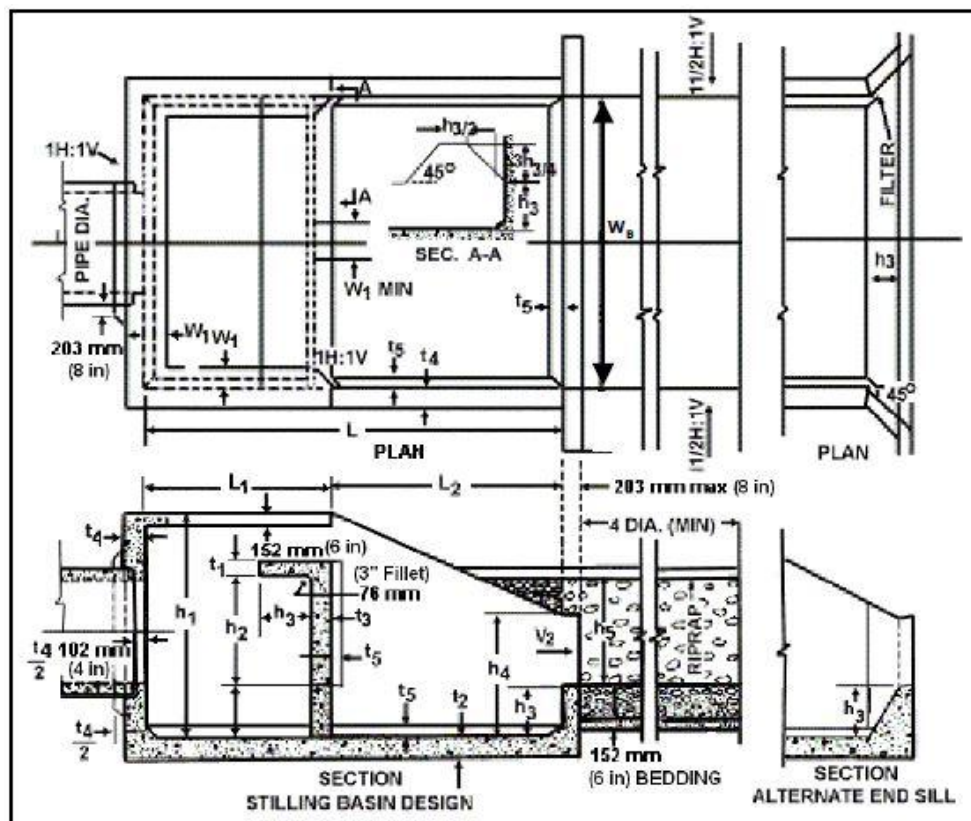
Plan and cross-section USBR VI Impact Stilling Basin
